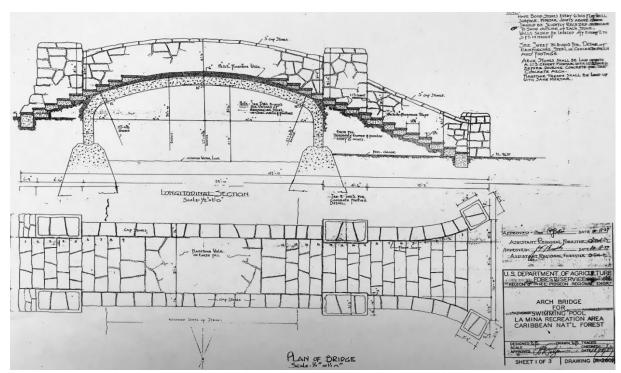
Original concrete bridge plans (1937) (EYNF Heritage Program Records).
